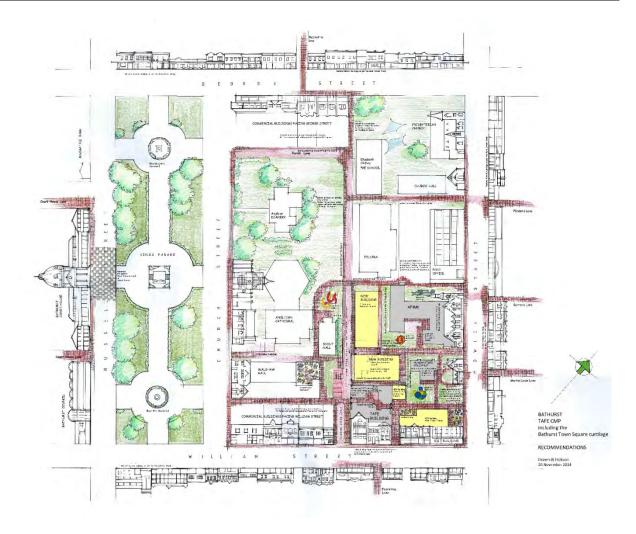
Part 1: Plan and elevations of the TAFE CMP and curtilage. Refer to larger scale addendum
